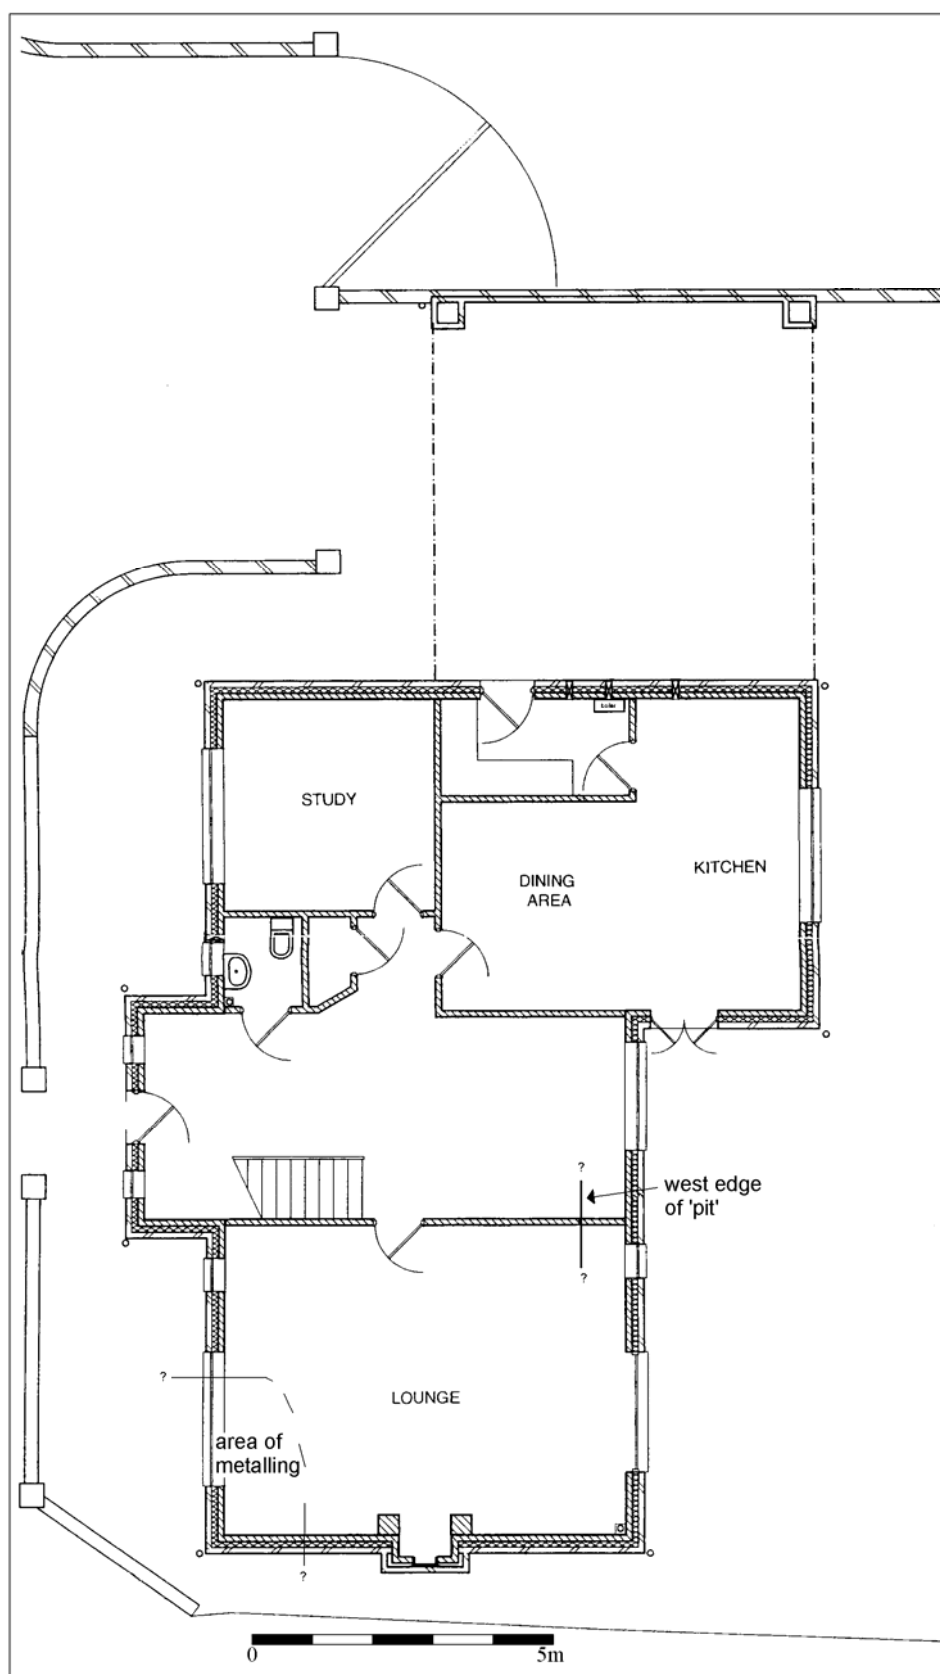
Developer plan for new dwelling, showing foundation plan and areas of interest
